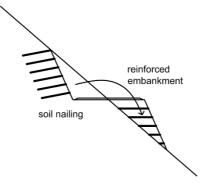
Construction of the road in mountainous area – combination of reinforced soil embankment and soil nailed cutting
